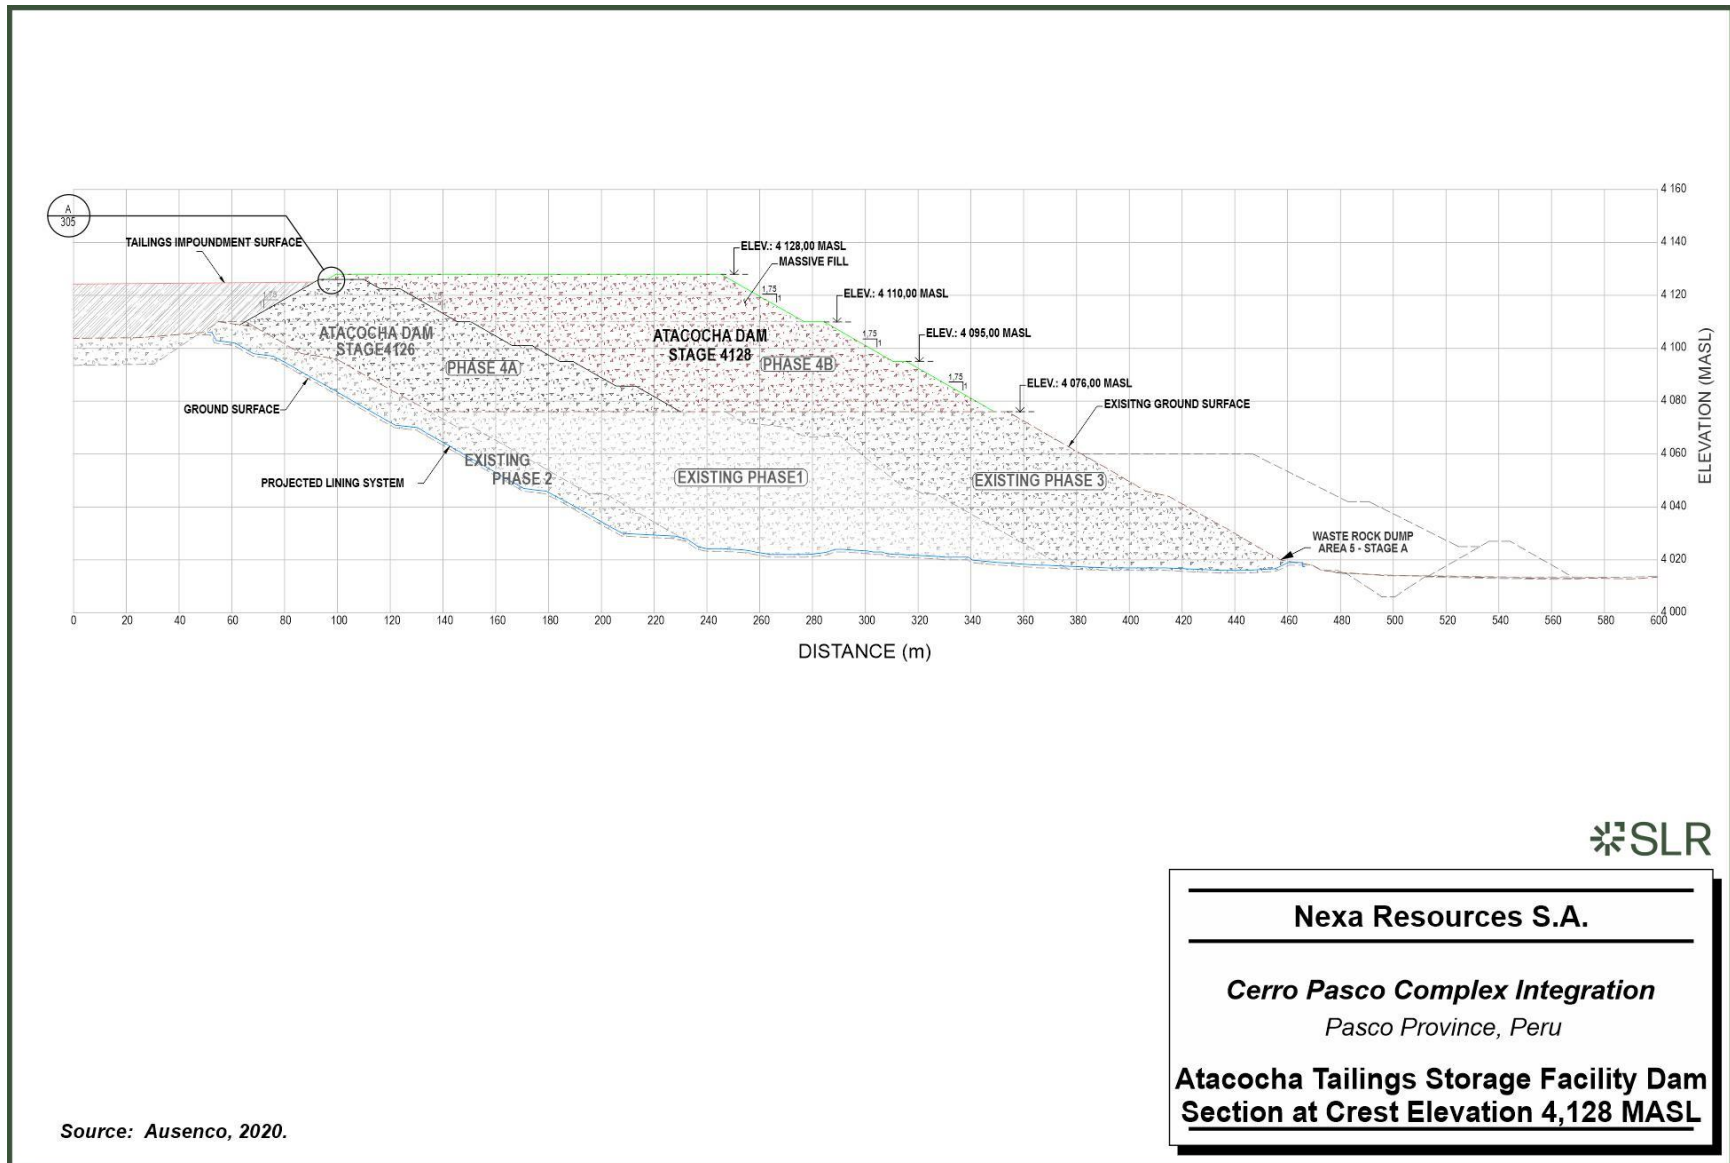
Atacocha Tailings Storage Facility Main Dam Section to Crest Elevation 4,128 MASL
